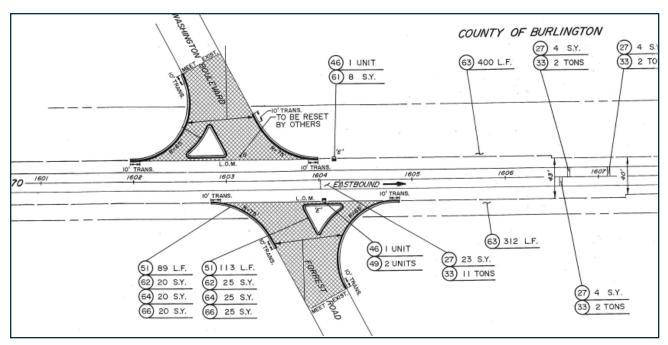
Intersection of Washington/Forrest Roads with Route 70.
